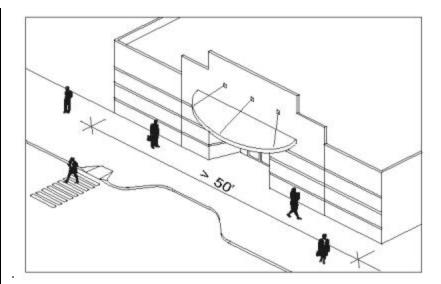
(B): Recessed building entrance provides a relief to a facade.
